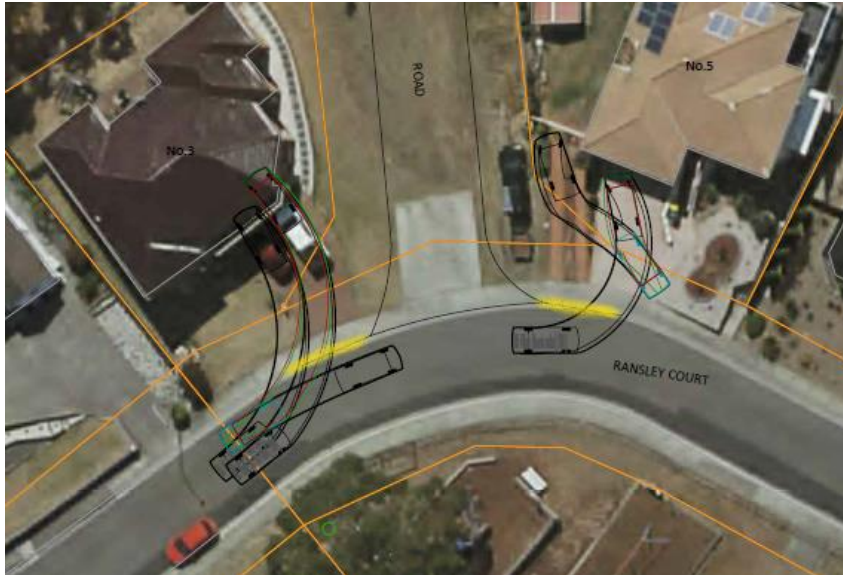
Driveway Access to 3 and 5 Ransley Court
